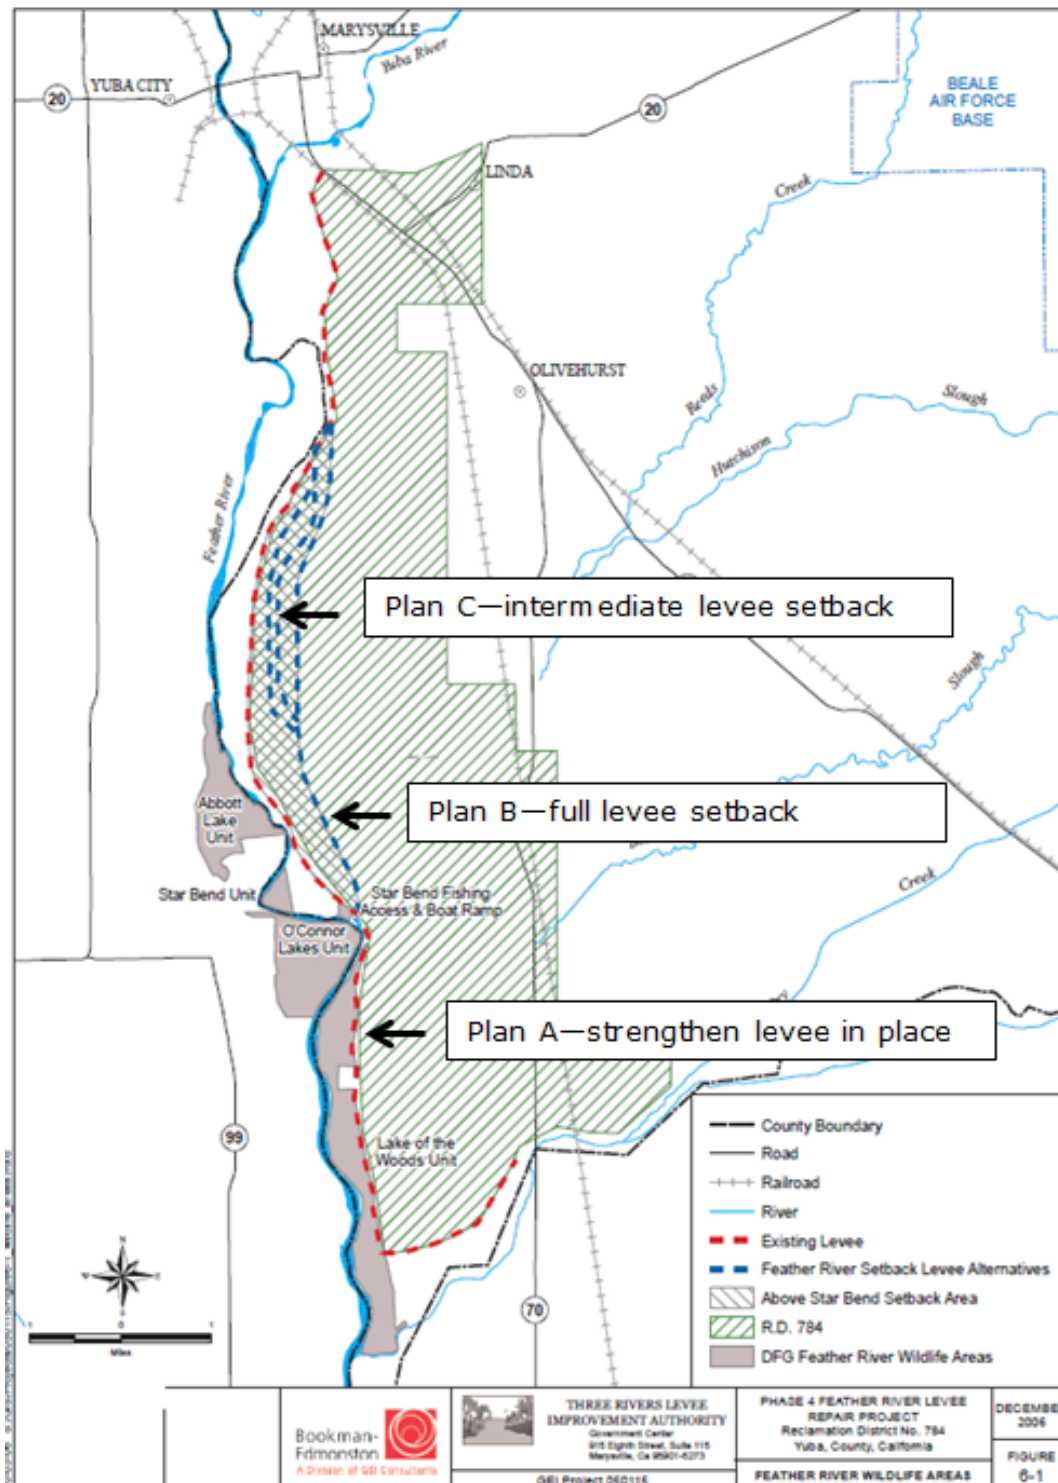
FRLRP Alternatives, including Plan A (Strengthen Levee in Place), Plan B (Full Levee Setback), and Plan C (Intermediate Levee Setback)
